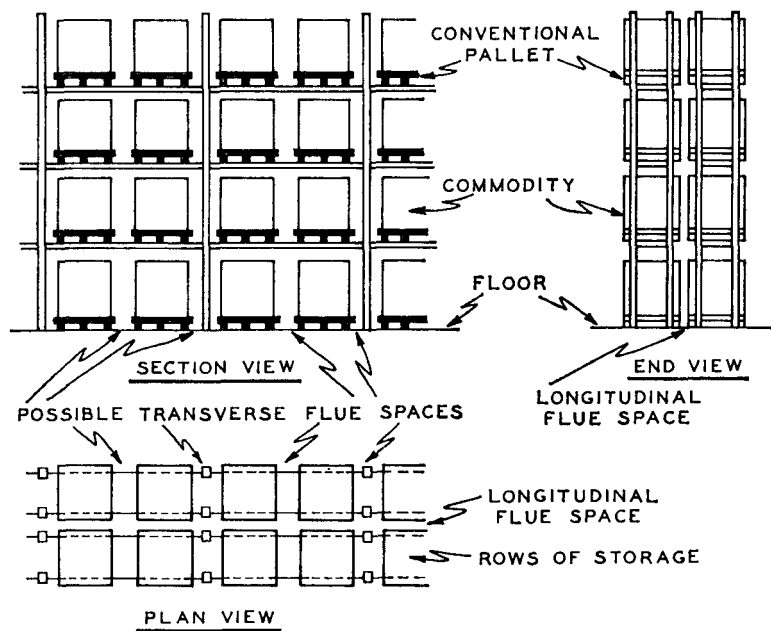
Typical Double Row (Back-to-Back) Rack Arrangement.
